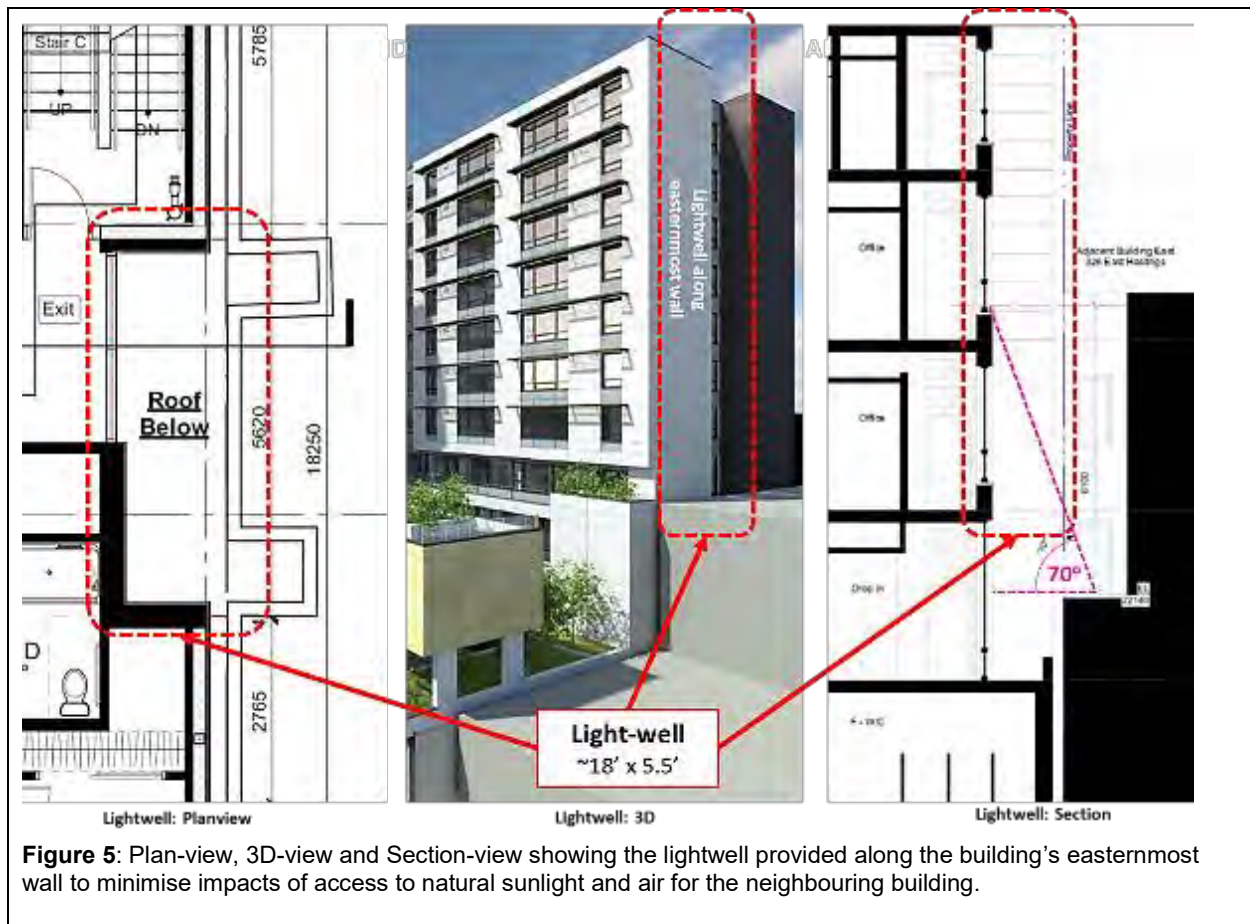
Plan-view, 3D-view and Section-view showing the lightwell provided along the building's easternmost wall to minimise impacts of access to natural sunlight and air for the neighbouring building.
